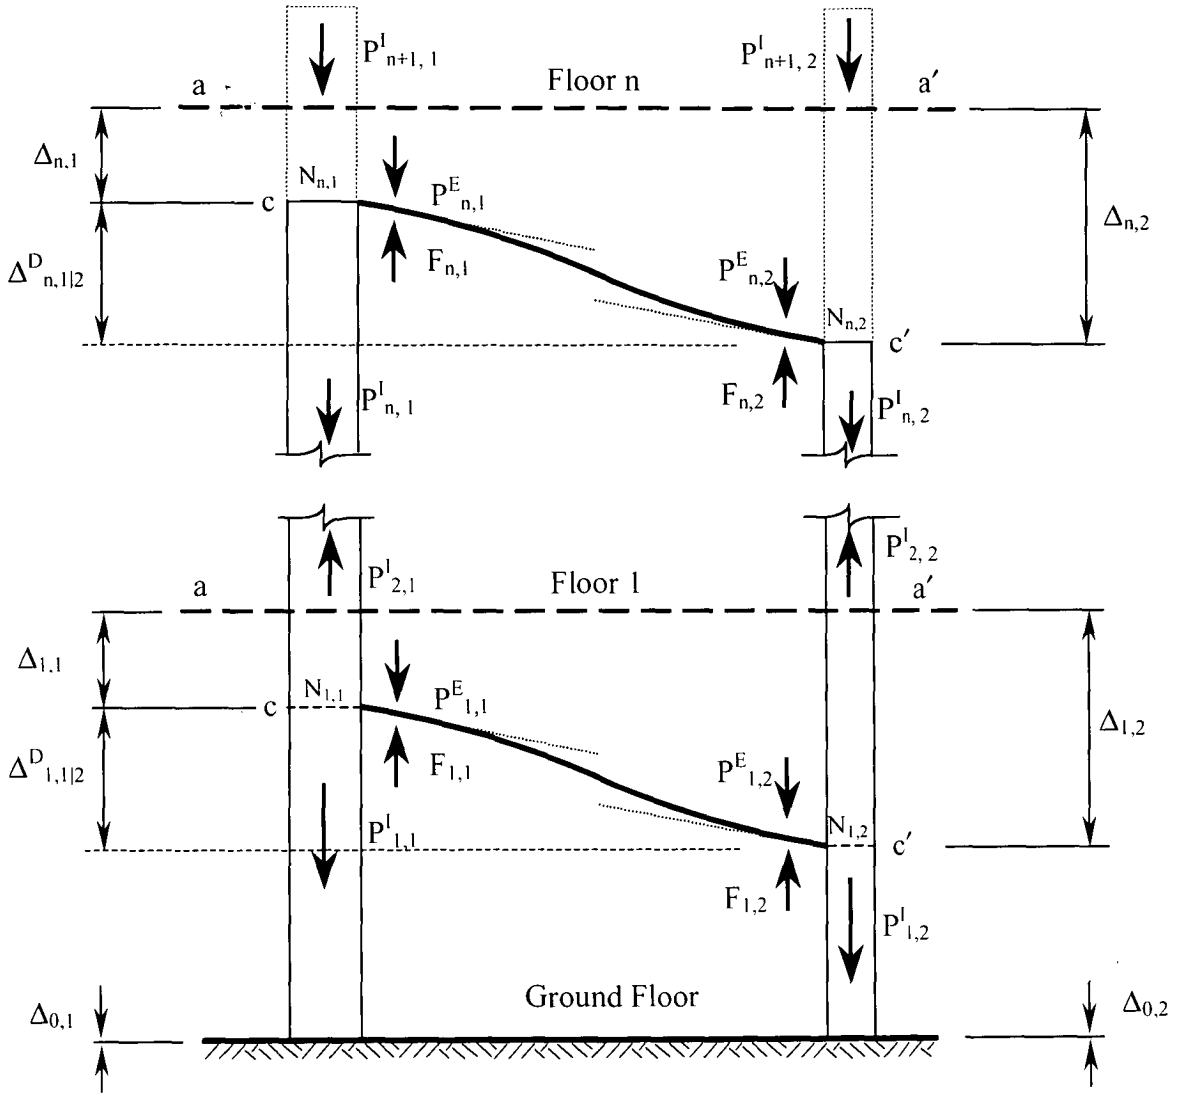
Typical column pairs, ground floor and top (nth) floor
